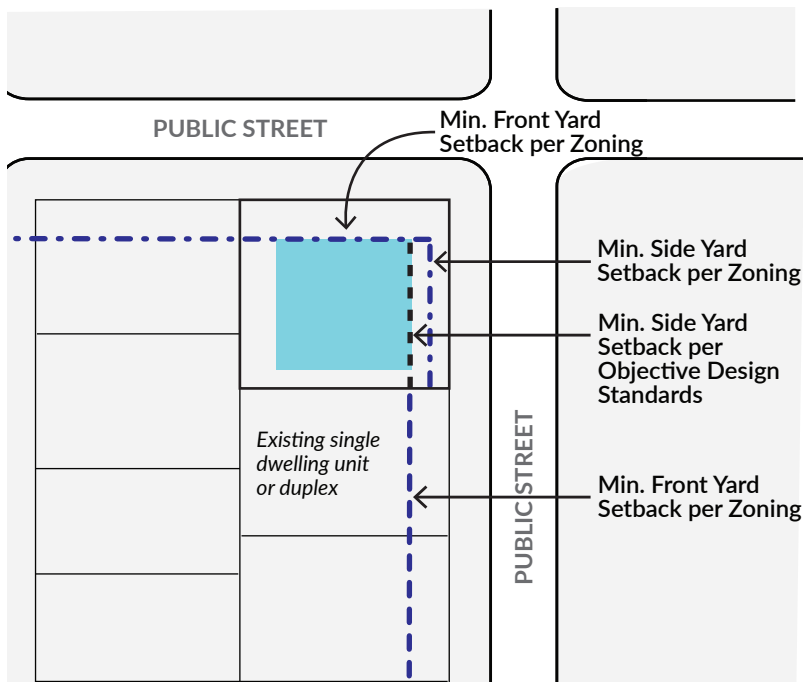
Front yard setbacks adjacent to single dwelling units on a corner lot.
